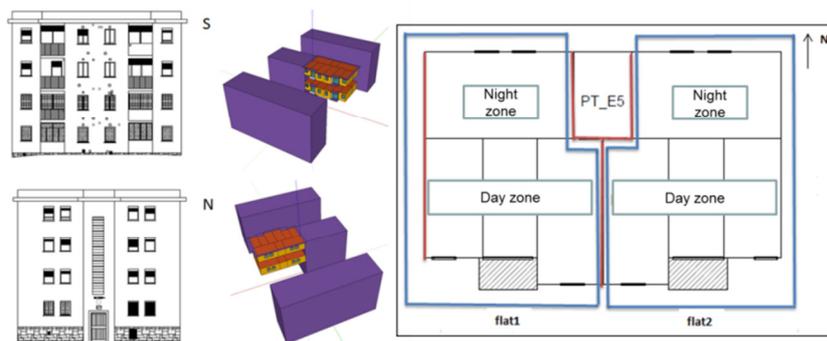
Example of building geometry. Left: North and south façade. Center: 3D model in Google SketchUp: standard floor, under roof floor and external environment. Right: dwelling zonification.
